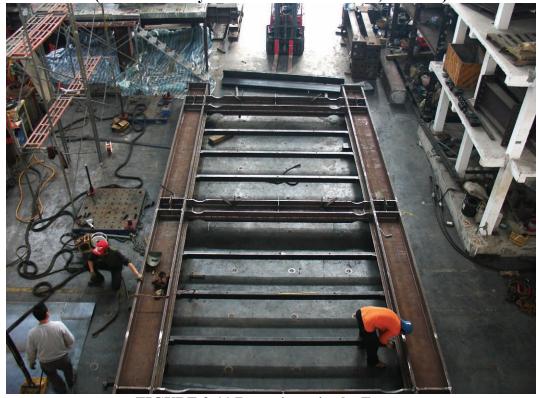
Restrainers in the Frame (Photo Courtesy of C.H.Lin and K.C.Tsai, NCREE)
